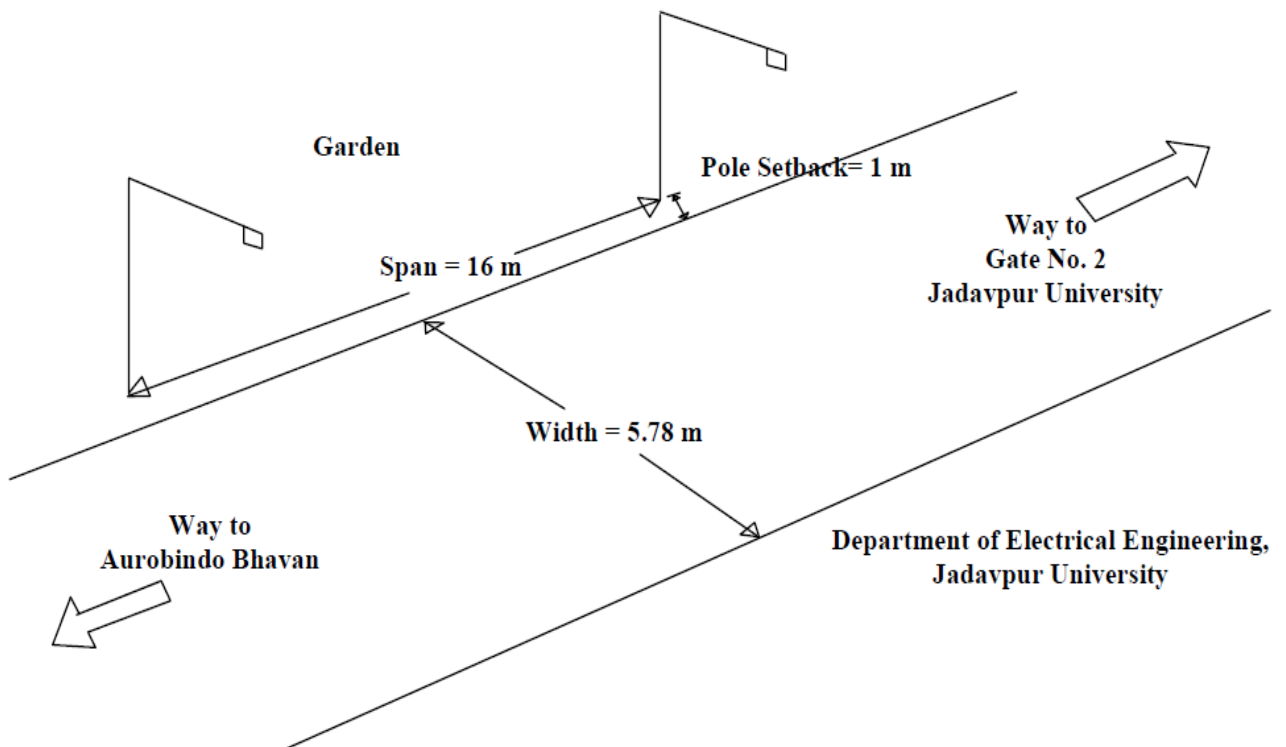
Layout Plan of the Road beside Department of Electrical Engineering, Jadavpur University
